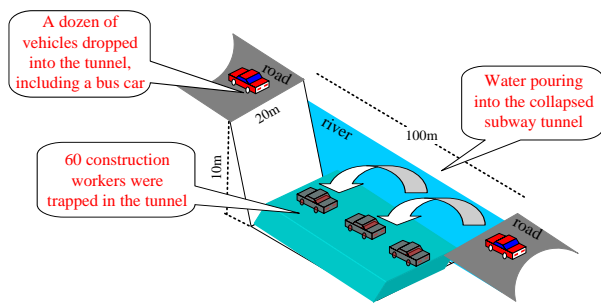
The scene of subway construction surface collapse accident in Hangzhou
